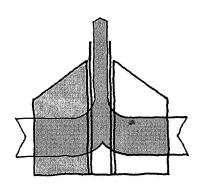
The chimney used as spatial element: chimney placed centrally in the house's plan with outlet above the roof's ridge.
